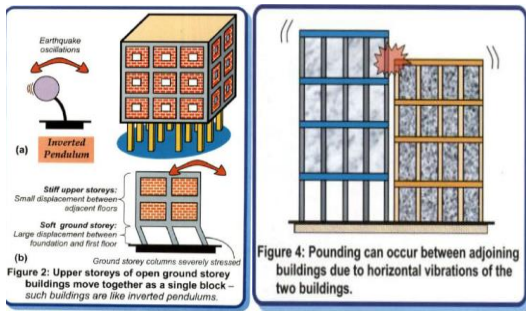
Fig 10. Arrangement not suitable for earthquakes (Source: www.bmtpc.org)
